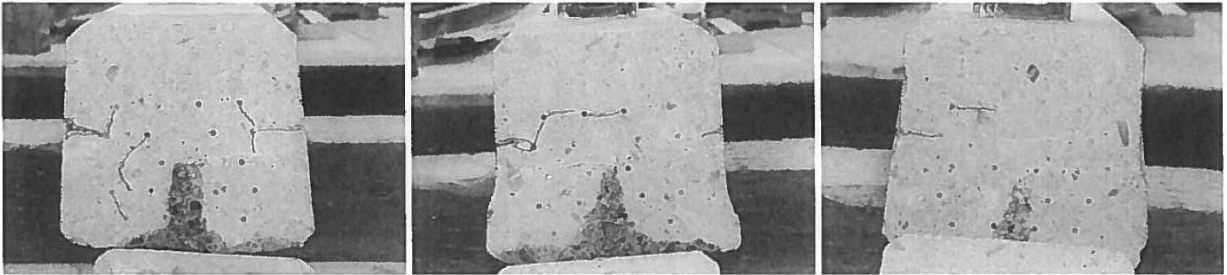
South end cross-sections of tie NDT #2 at saw cuts 4 inches (left), 8 inches (center) and 14 inches (right) from end, cracks outlined in red.
